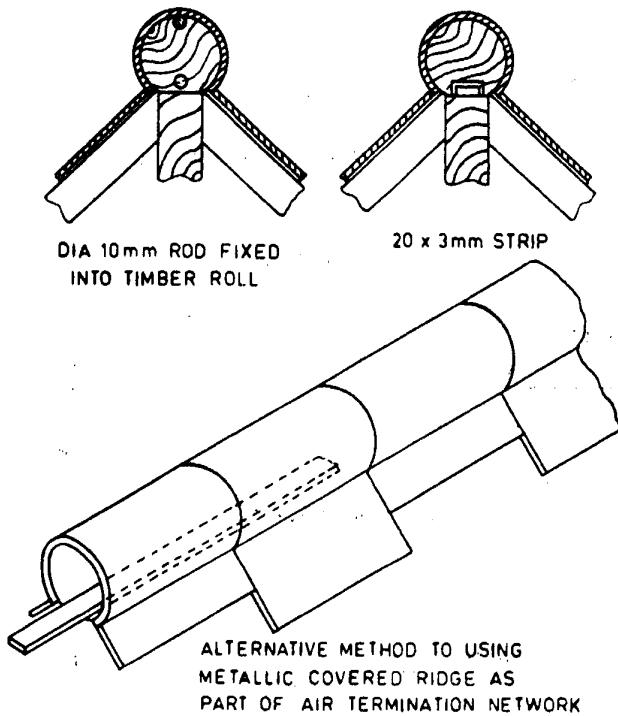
AIR TERMINATIONS FOR TILED ROOFS
